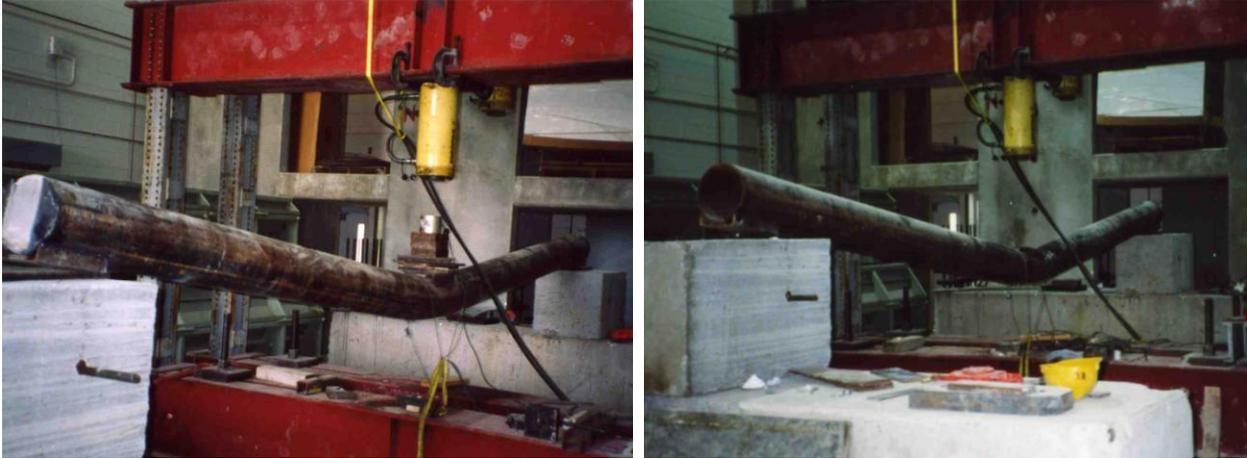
Test setup for hollow and concrete-filled pipes
